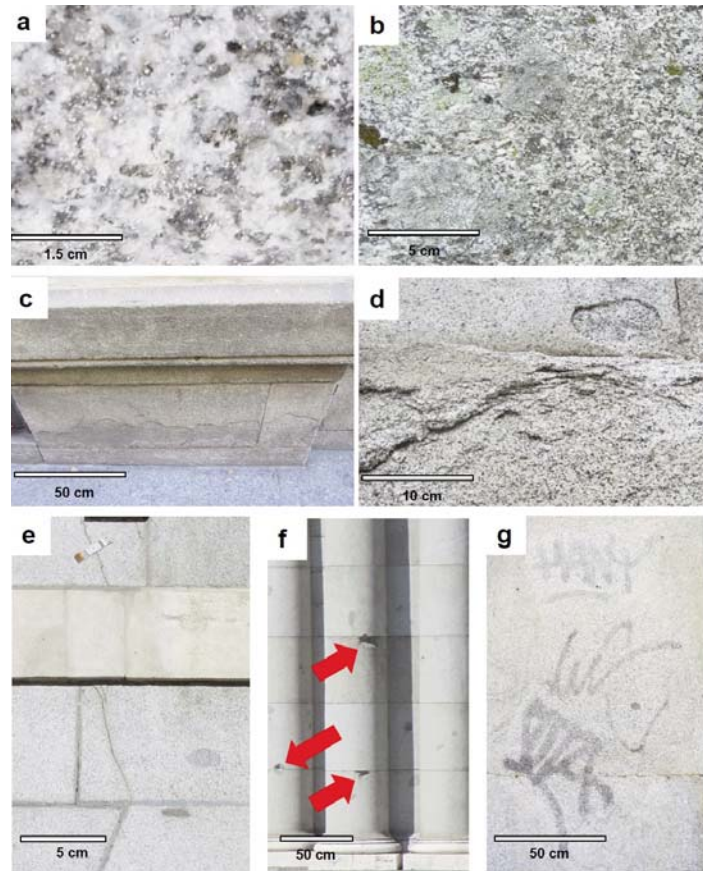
Decay in Piedra Berroqueña: a) salt efflorescence, indoor columns on Conde Duque Palace, Madrid; b) biodecay, Nuestra Señora de la Asunción church, Colmenar Viejo; c) scaling, Madrid; d) scaling and flaking, San Andrés Church, Madrid; e) cracking, Chamber of Deputies, Spanish Parliament, Madrid; f) bullet impact, Alcalá Gate, Madrid; g) graffiti, Madrid.
